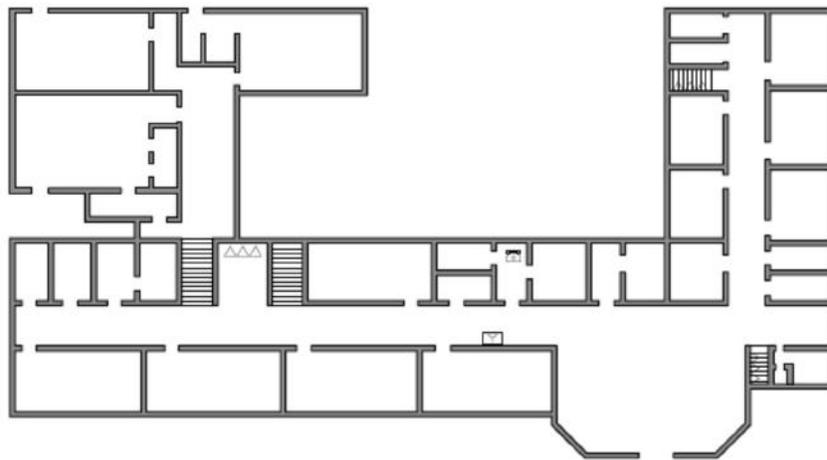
Typical floor plan for a RC frame building with masonry infills (Ene-Say School #21, Bishkek).
